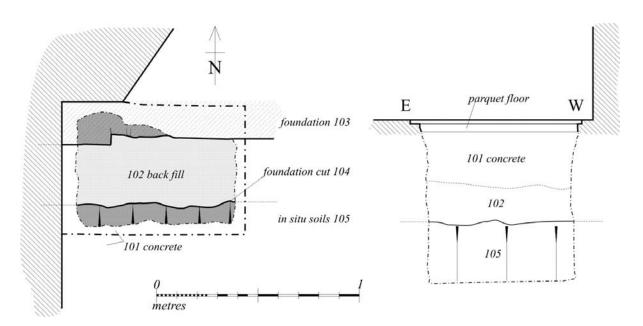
Trench 1 plan and Figure 5 trench 1 section
